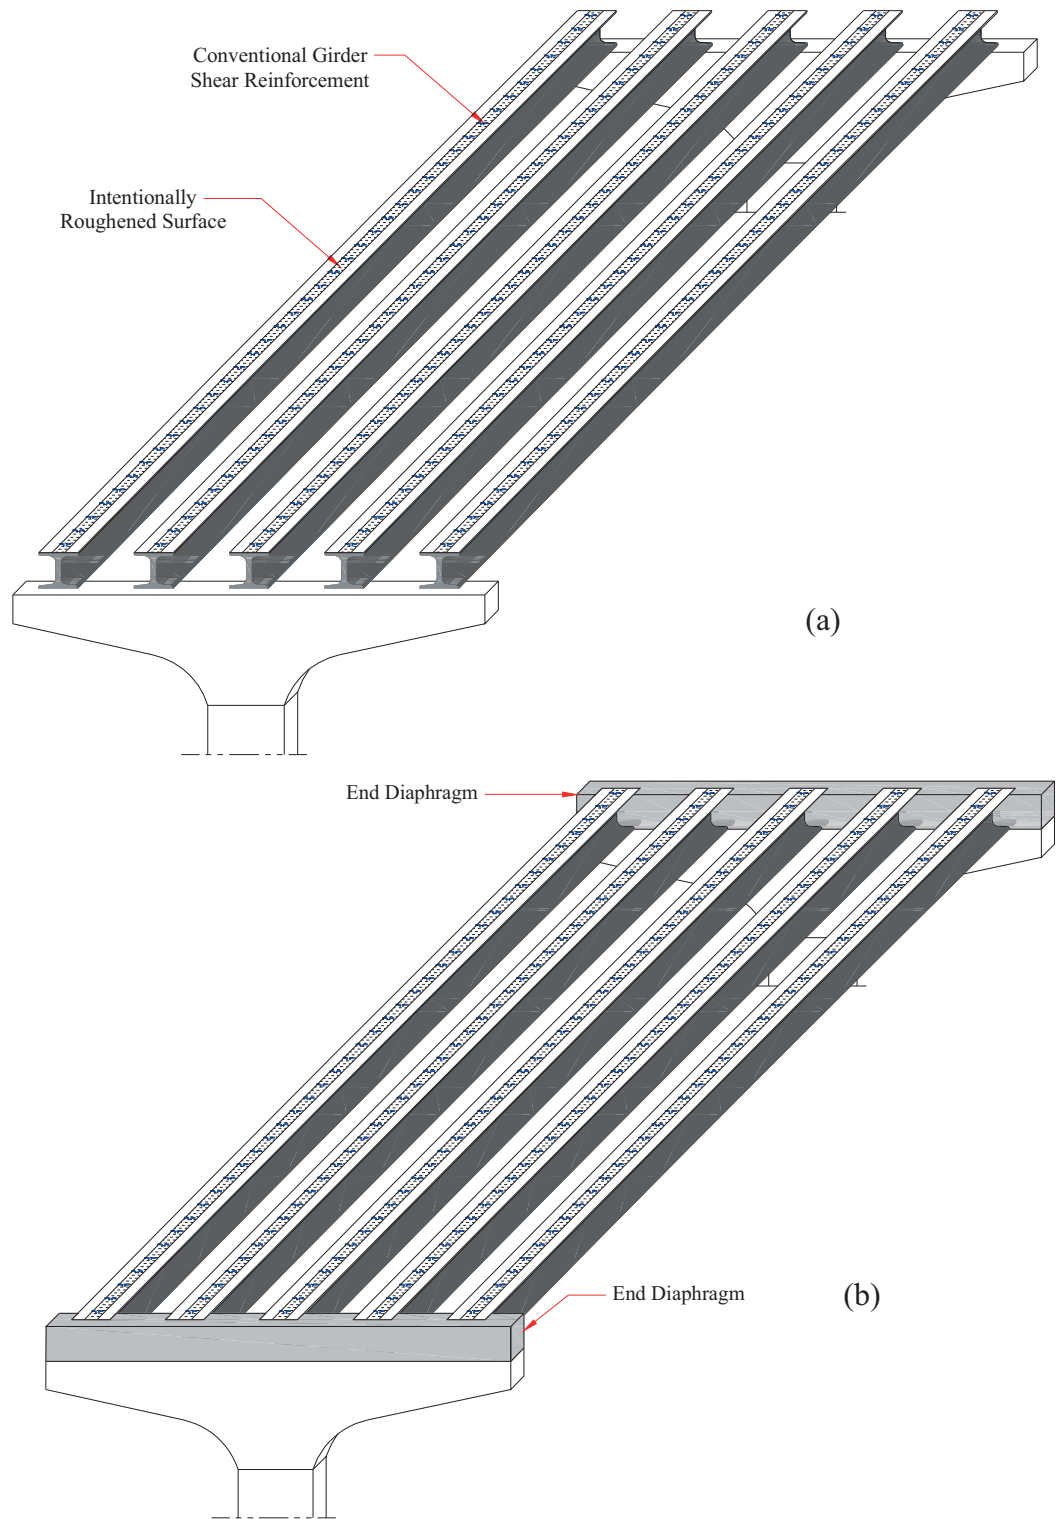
Construction Sequence of the Proposed Precast Concrete Deck-to-Concrete Girder Connection Using UHPC
